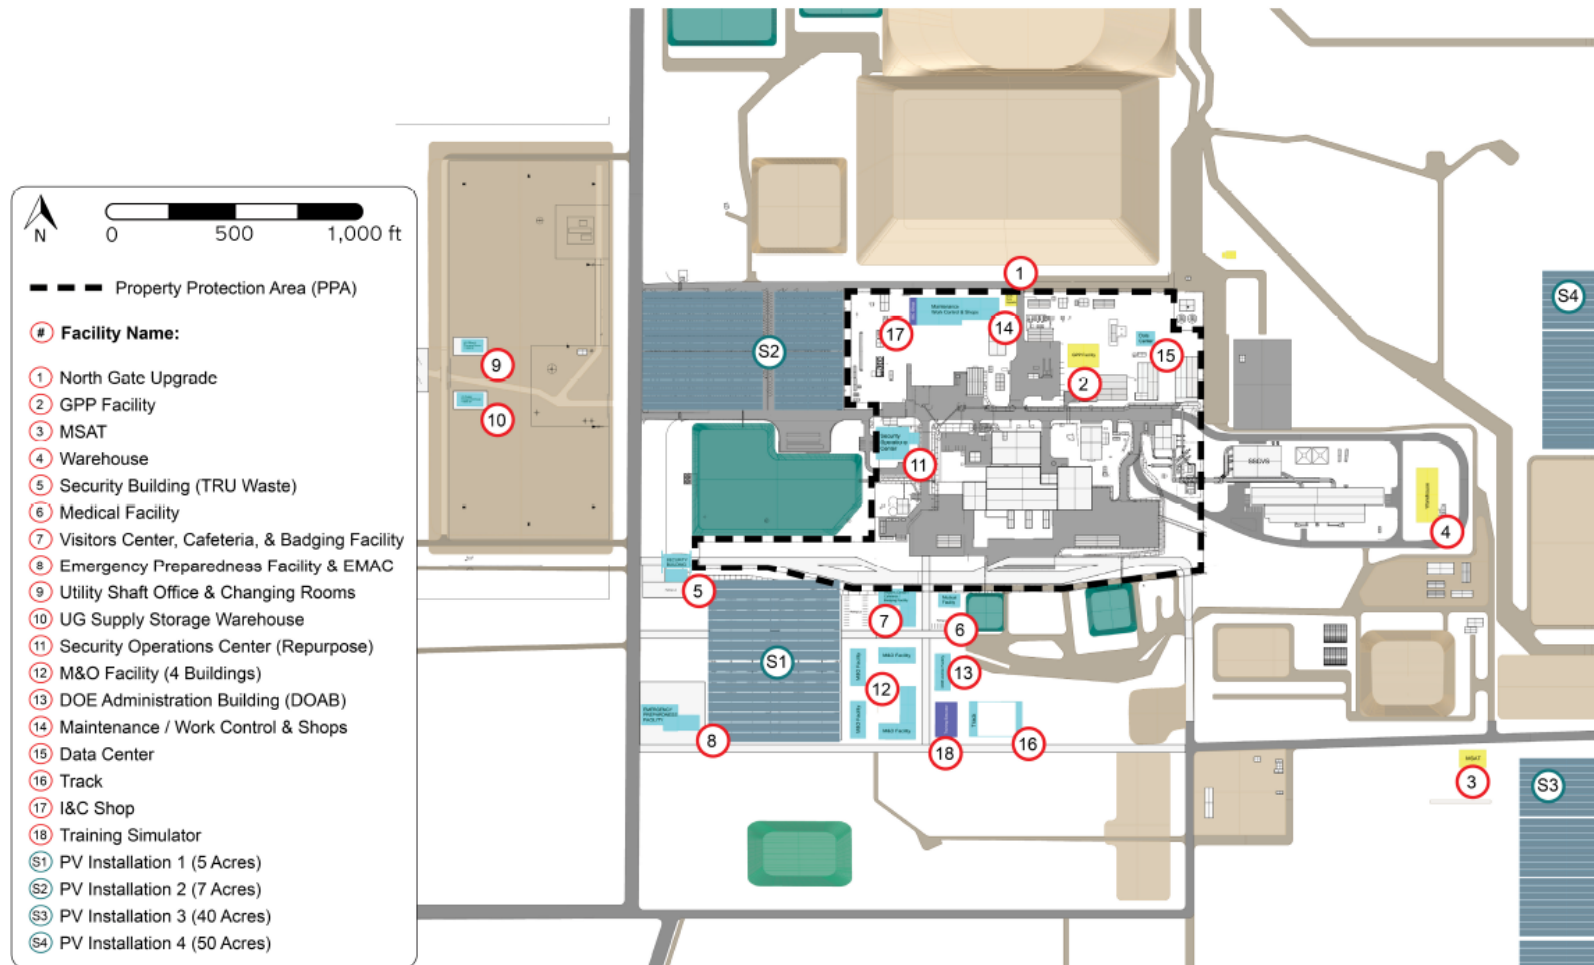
Location of Proposed New Facilities at the WIPP Site
